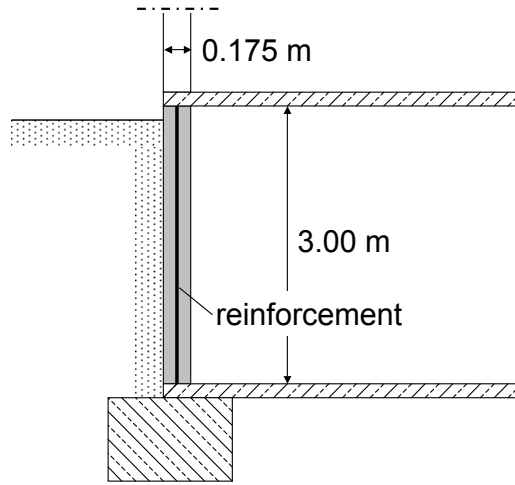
Reinforced masonry basement wall subjected to lateral earth pressure
